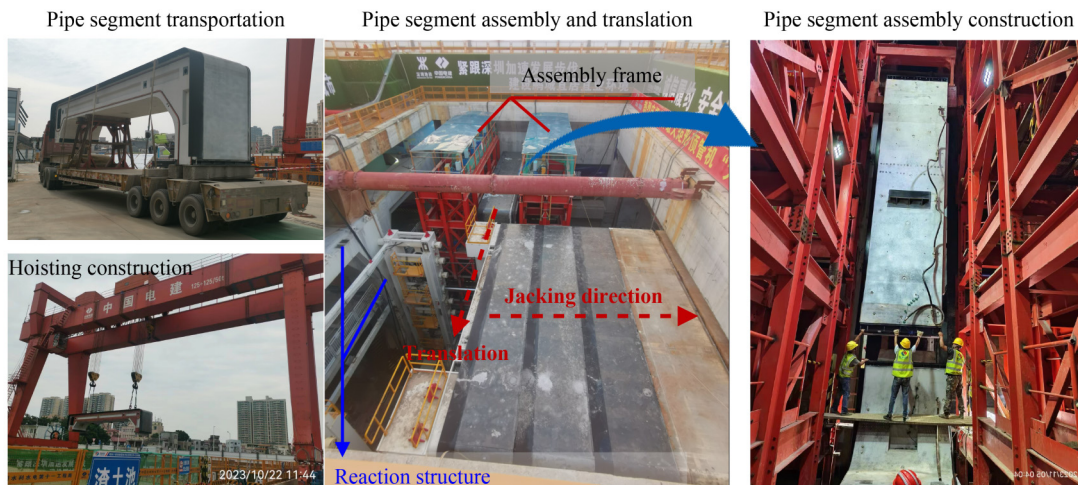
Assembly technology for prefabricated pipe jacking ring segments.
